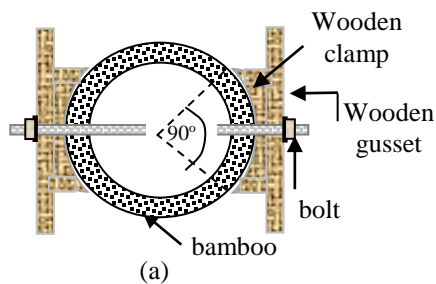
The proposed bamboo connection system (truss structure) [8], [9]
